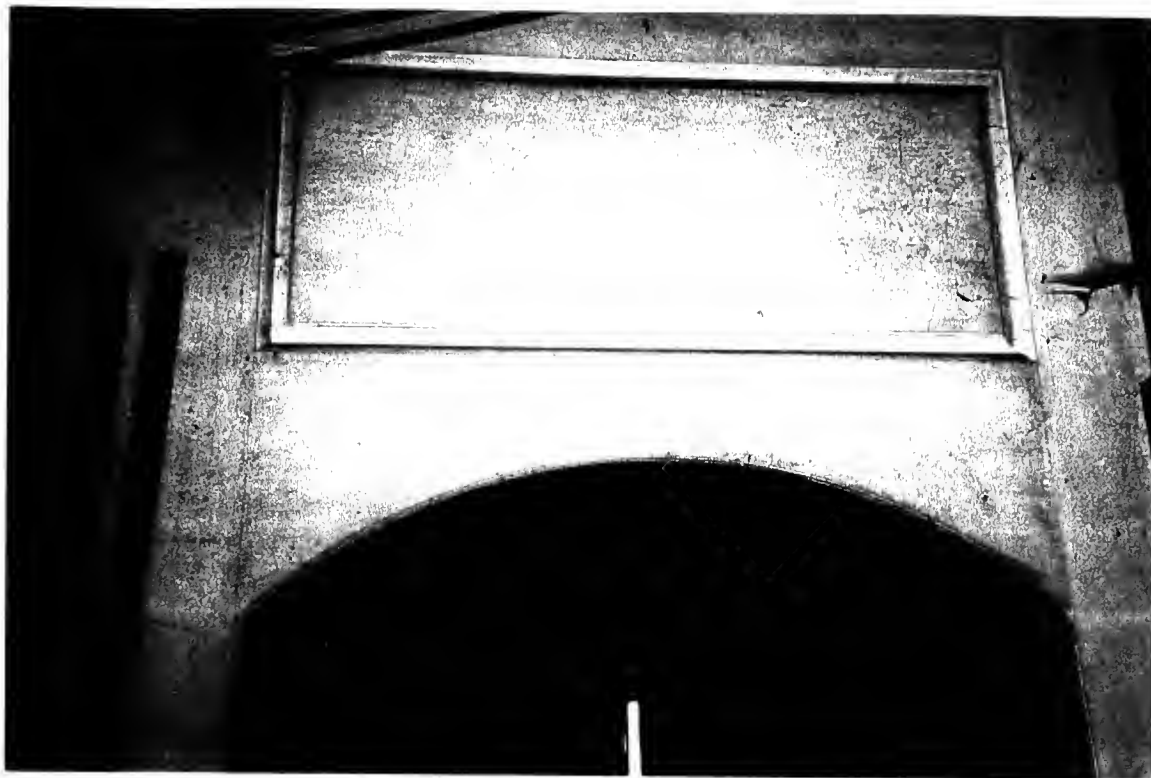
This is the south elevation of the arched passage. This side is not affected by the need for a double-thick board wall for two raised panels.
